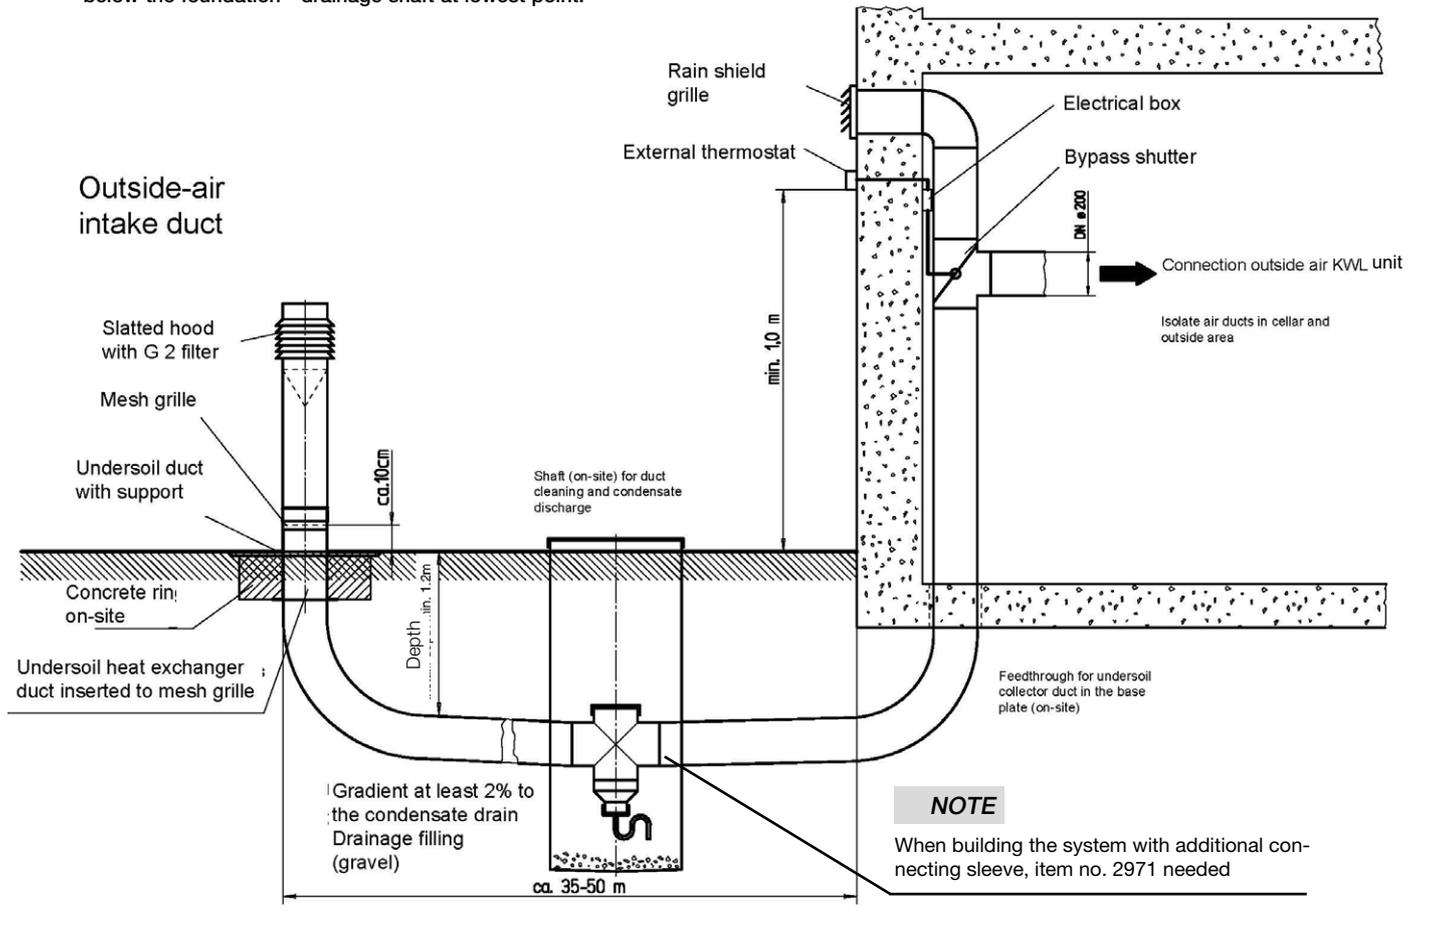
Basic diagram for installation of LEWT in buildings without basements below the foundation - drainage shaft at lowest point.
